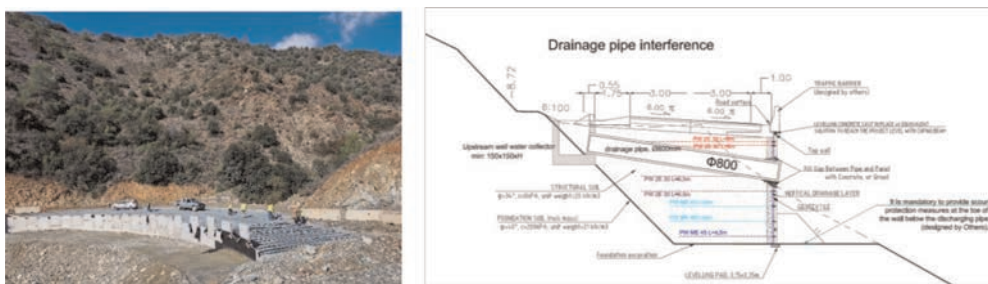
Trapezoidal wall in mountain area: (a) strips installation; (b) storm pipe interference detail.
